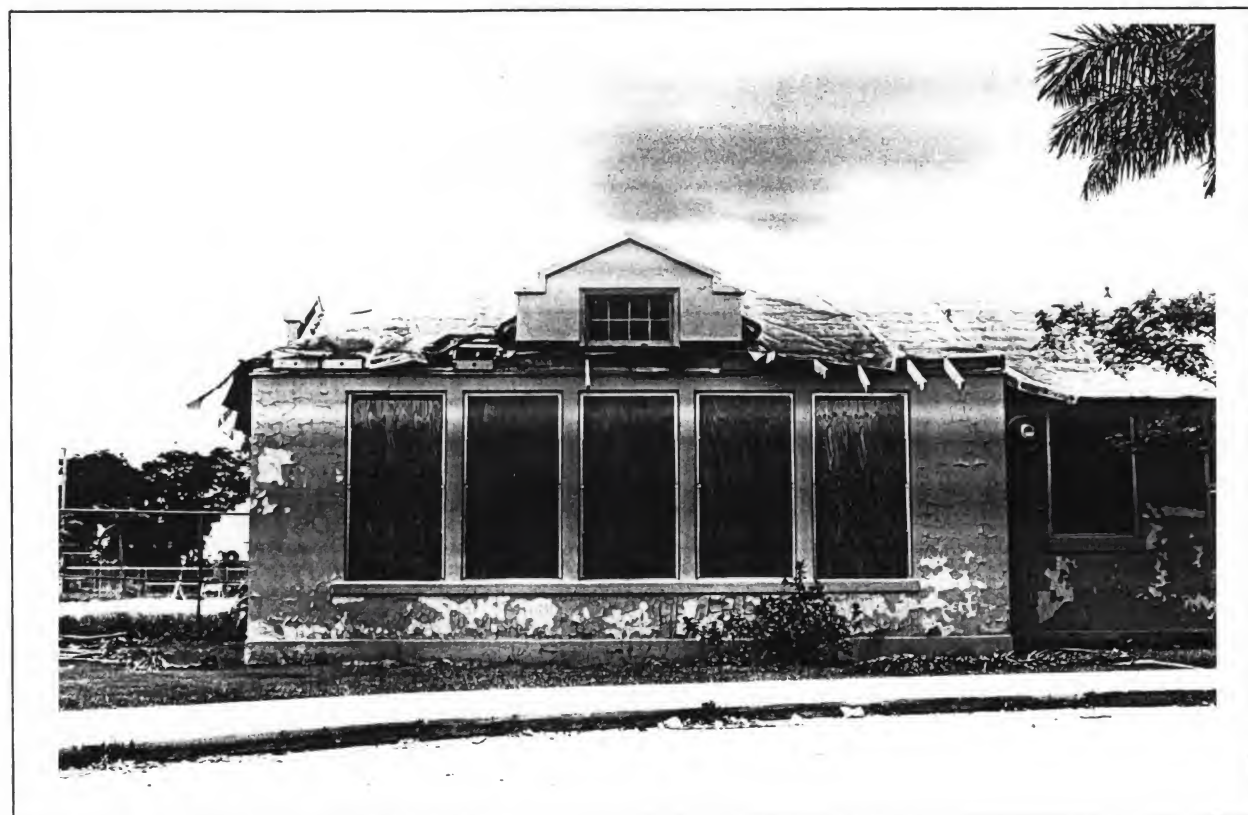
REDLAND ELEMENTARY SCHOOL, SOUTH ELEVATION, LEFT SIDE.
